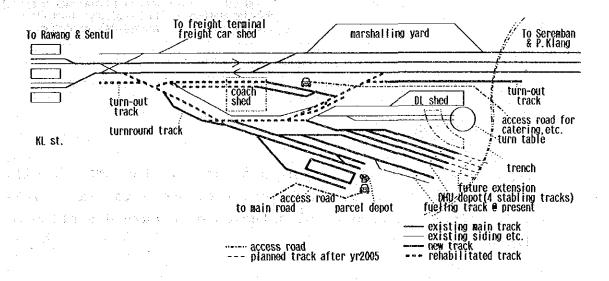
Track Layout of Brickfield Complex in RBCS
